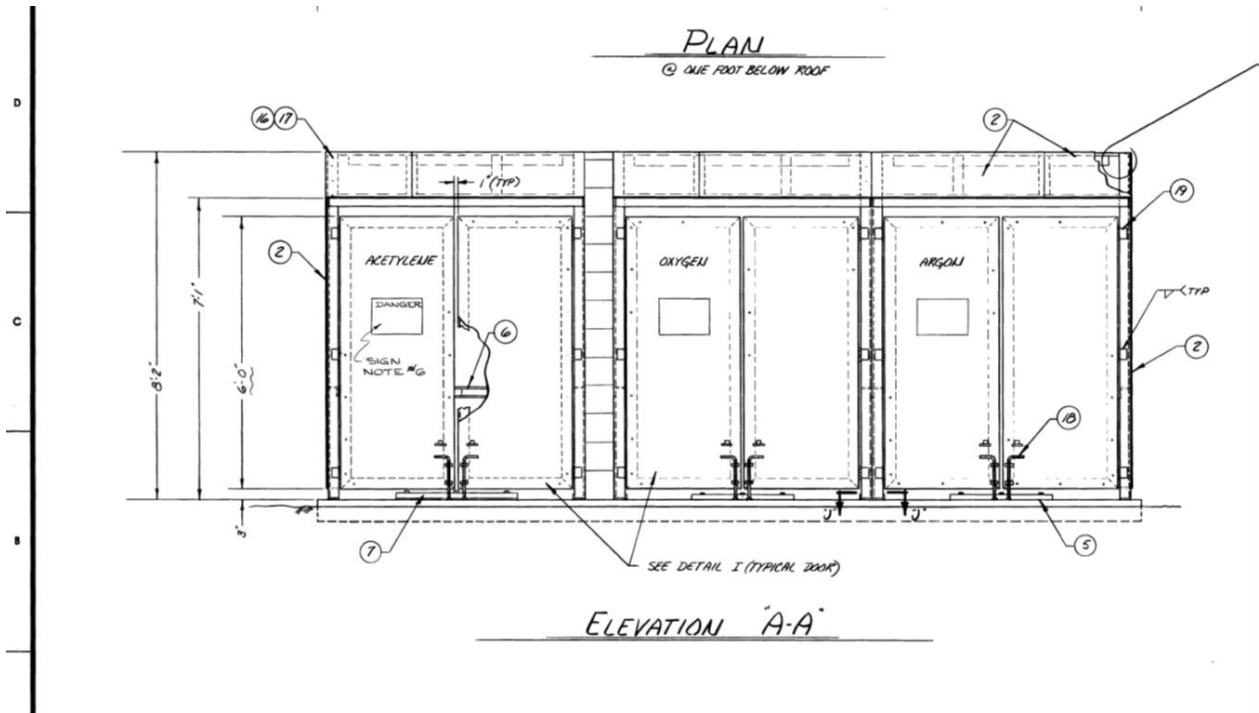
2734ZK Gas Bottle Storage Building Design Drawing, Front View
